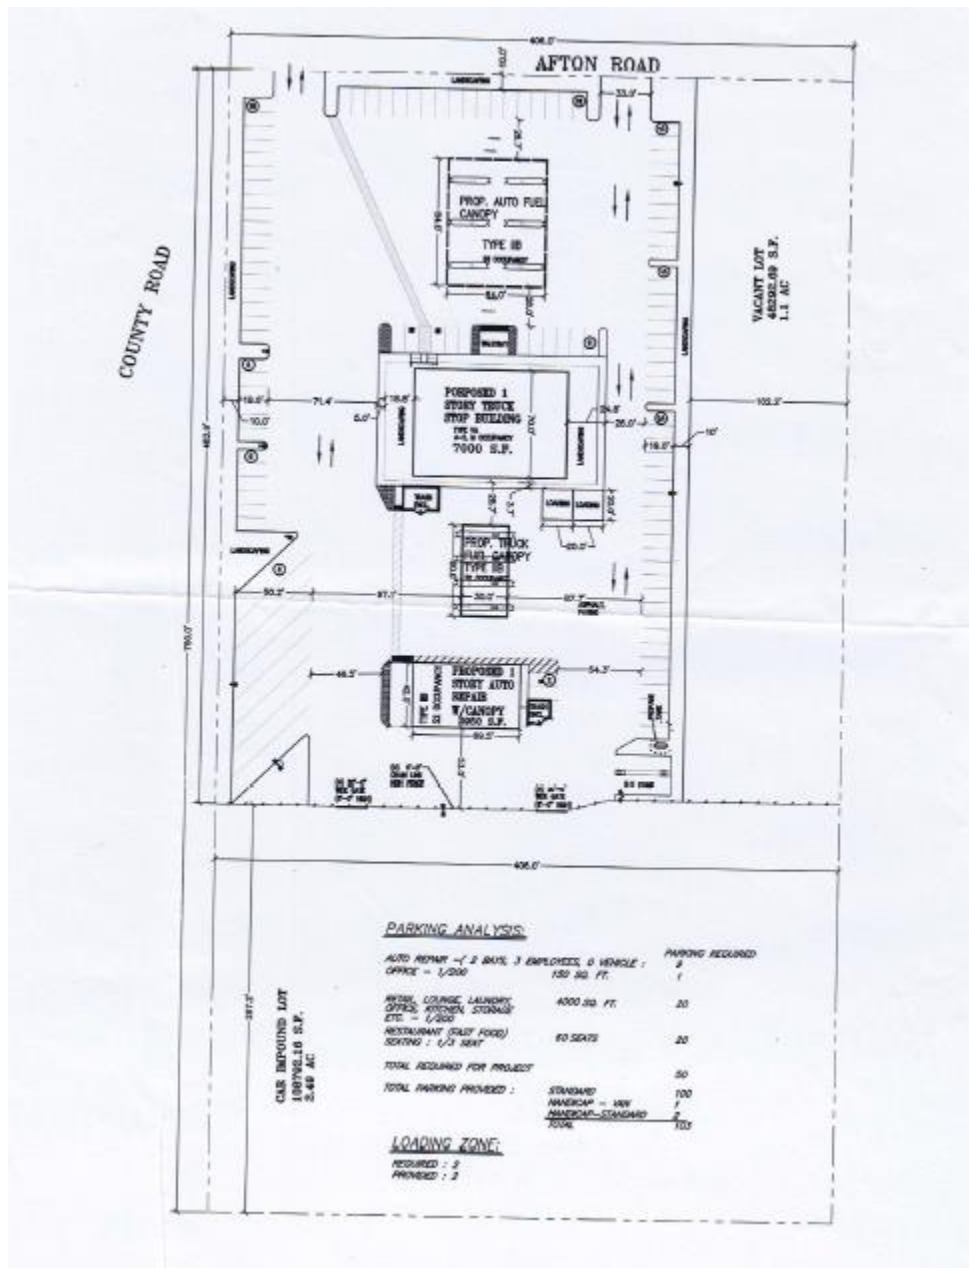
Proposed project plans- 45101 Afton Canyon Road., Baker, CA 92309.
